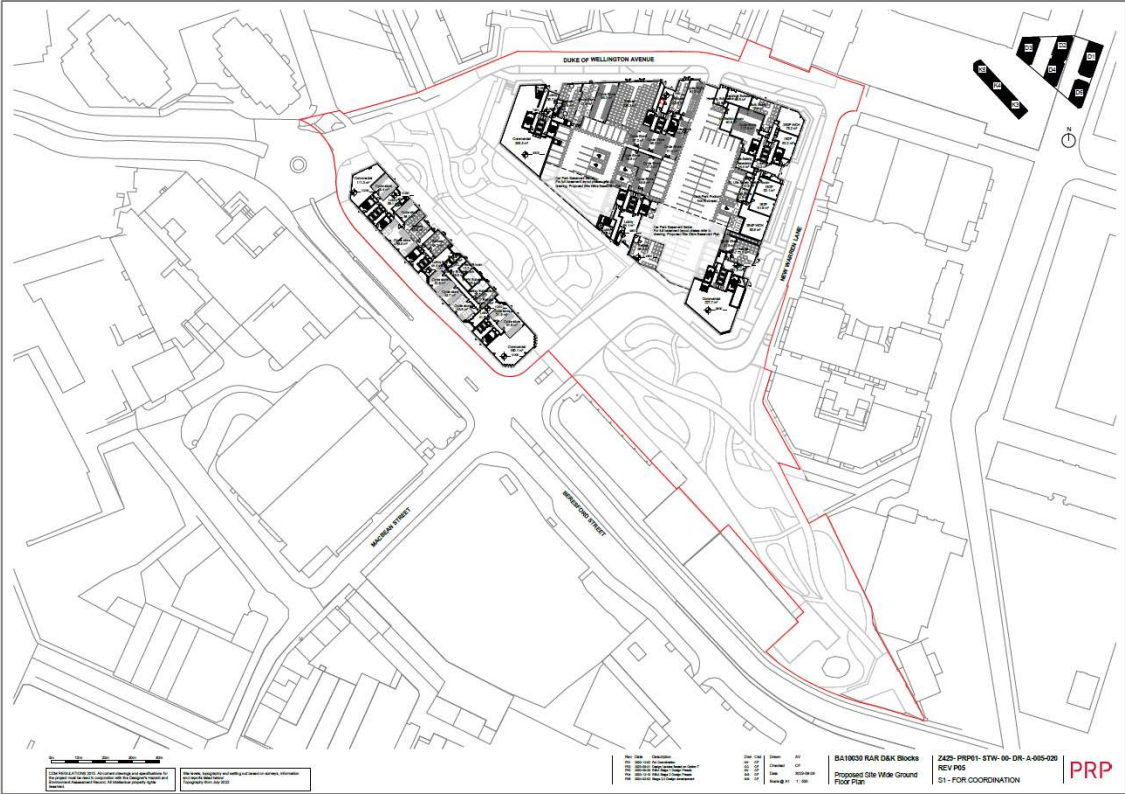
Proposed Ground Floor Layout – PRP Architects (February 2024)
